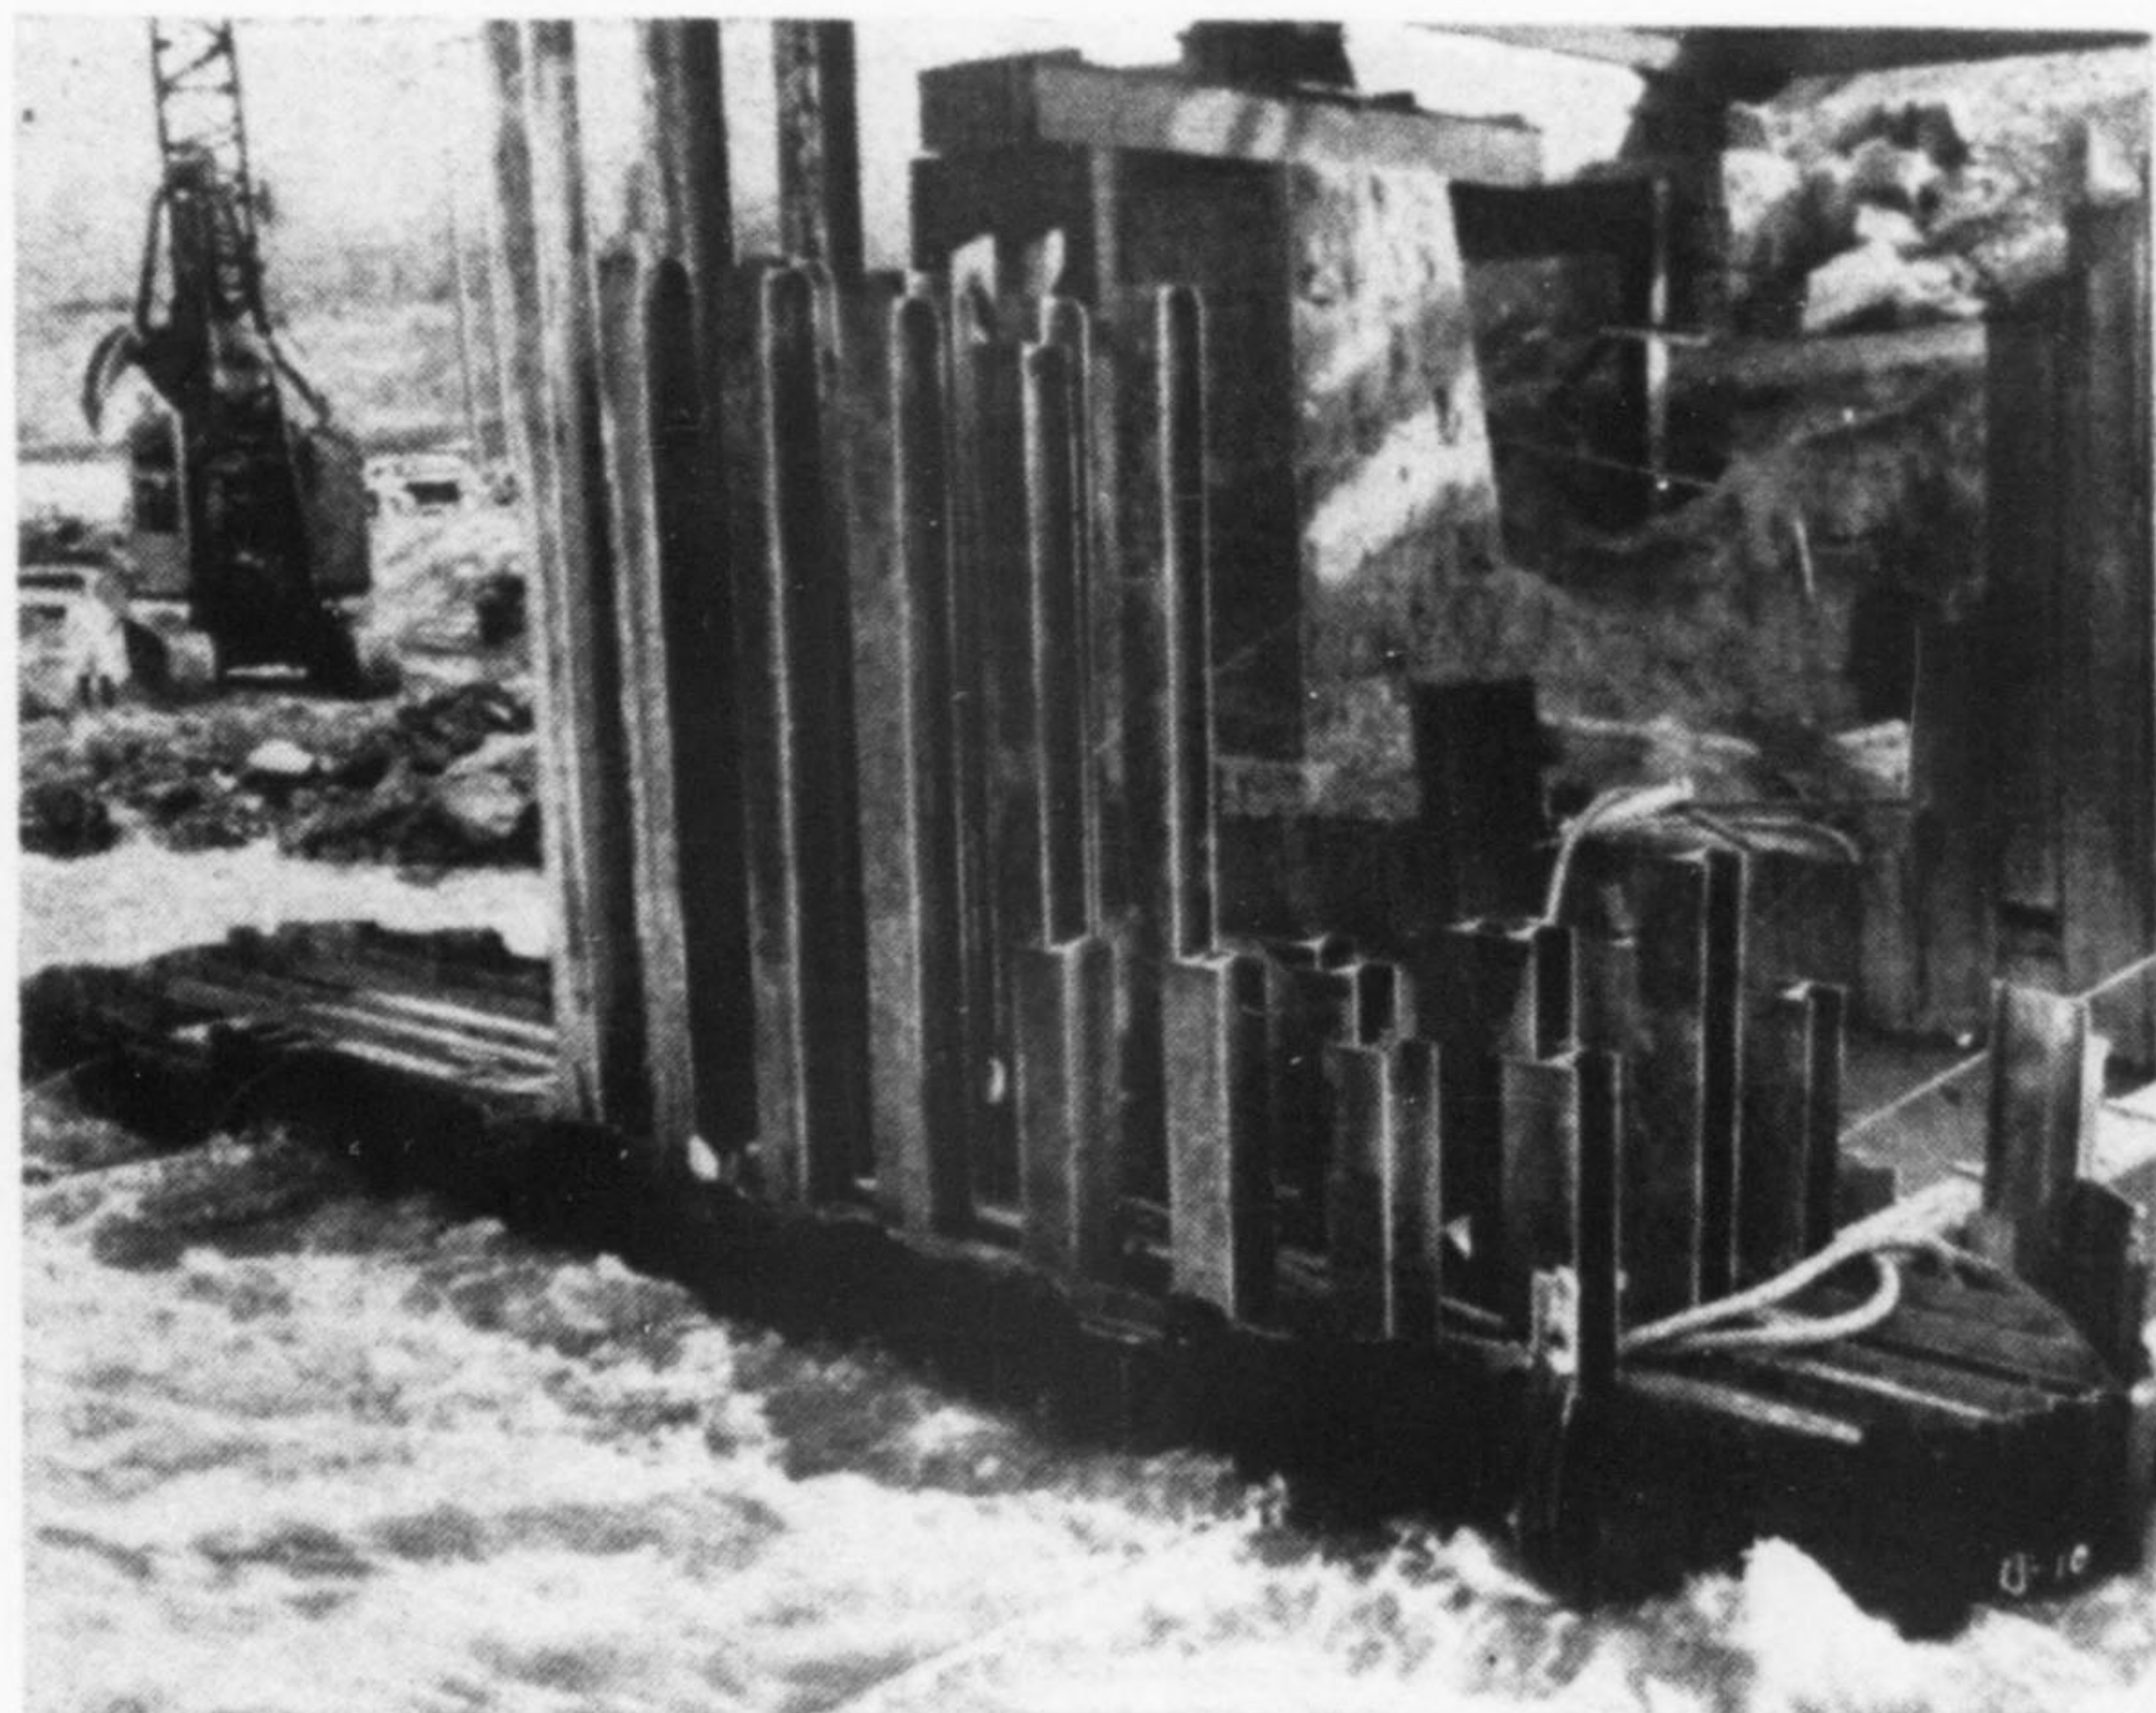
The structural frame around which the sheet piles were driven also served to hold guides for positioning H-piles. Piles were later extended upward to 6 ft. below the bridge seat.
